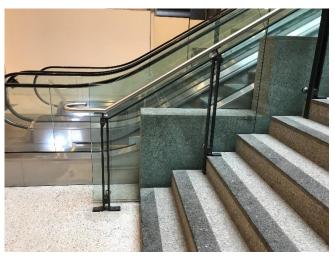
Profile of metal handrail, metal posts, glass partition, and stepped granite wall
